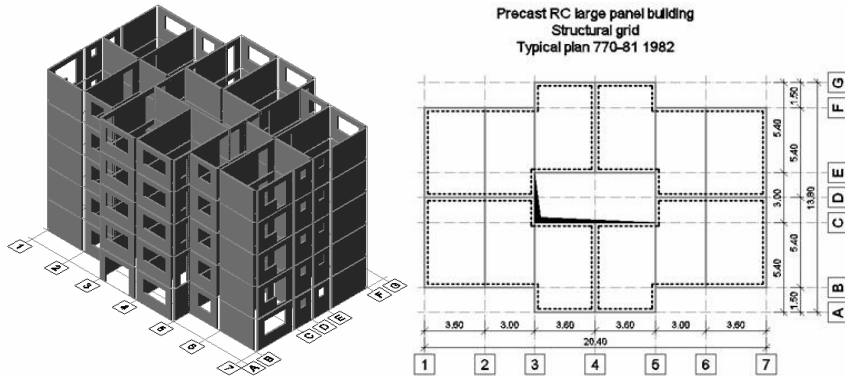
Distribution and arrangement of the walls and the structural grid of the typical plan
